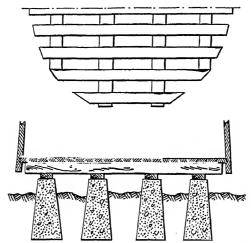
Fifty-thousand-gallon wooden tank foundation.
